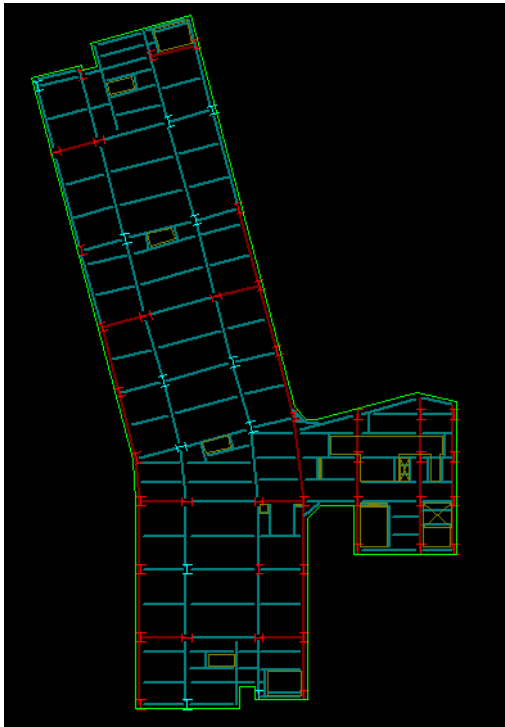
Bed Tower Layout with Fewer Infills and Modified Layout
